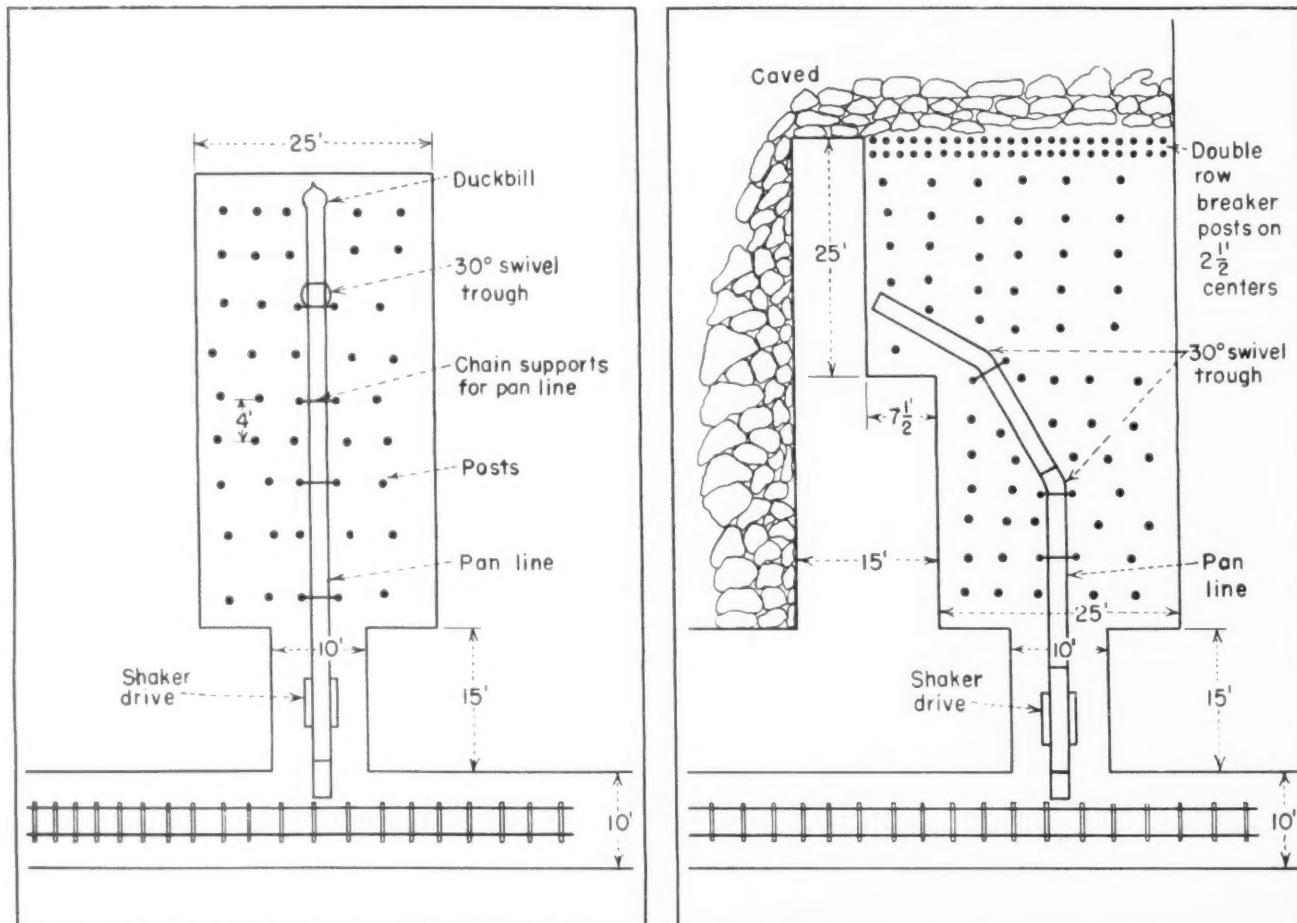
TIMBERING AND ROOM WORK with duckbills at Eagle.
